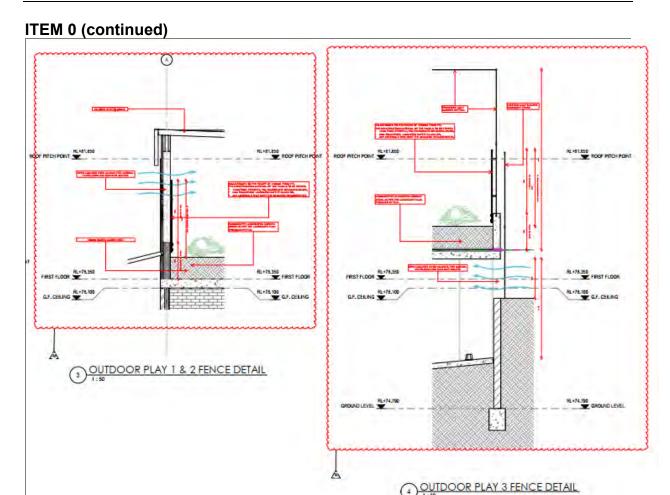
Proposed Detailed Section indicating the design of the front acoustic walls (left) and the rear acoustic walls.
